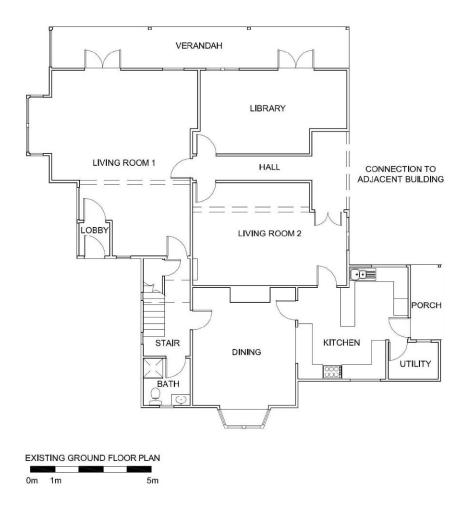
Ground floor plan at time of building removal (image courtesy Chessa Stevens)
